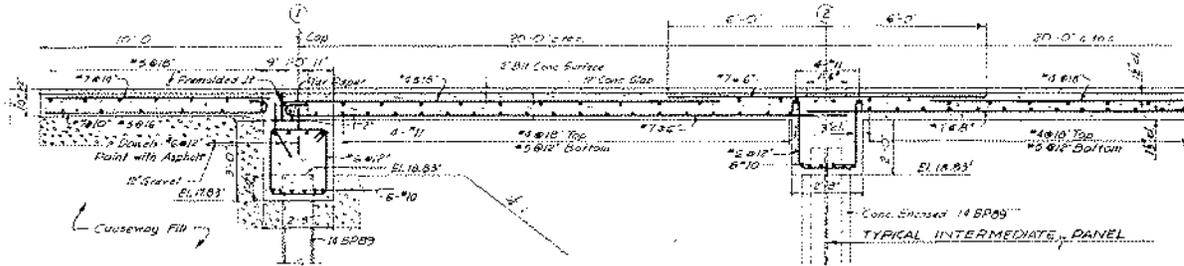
South Pier Approach Trestle Longitudinal Deck Section
